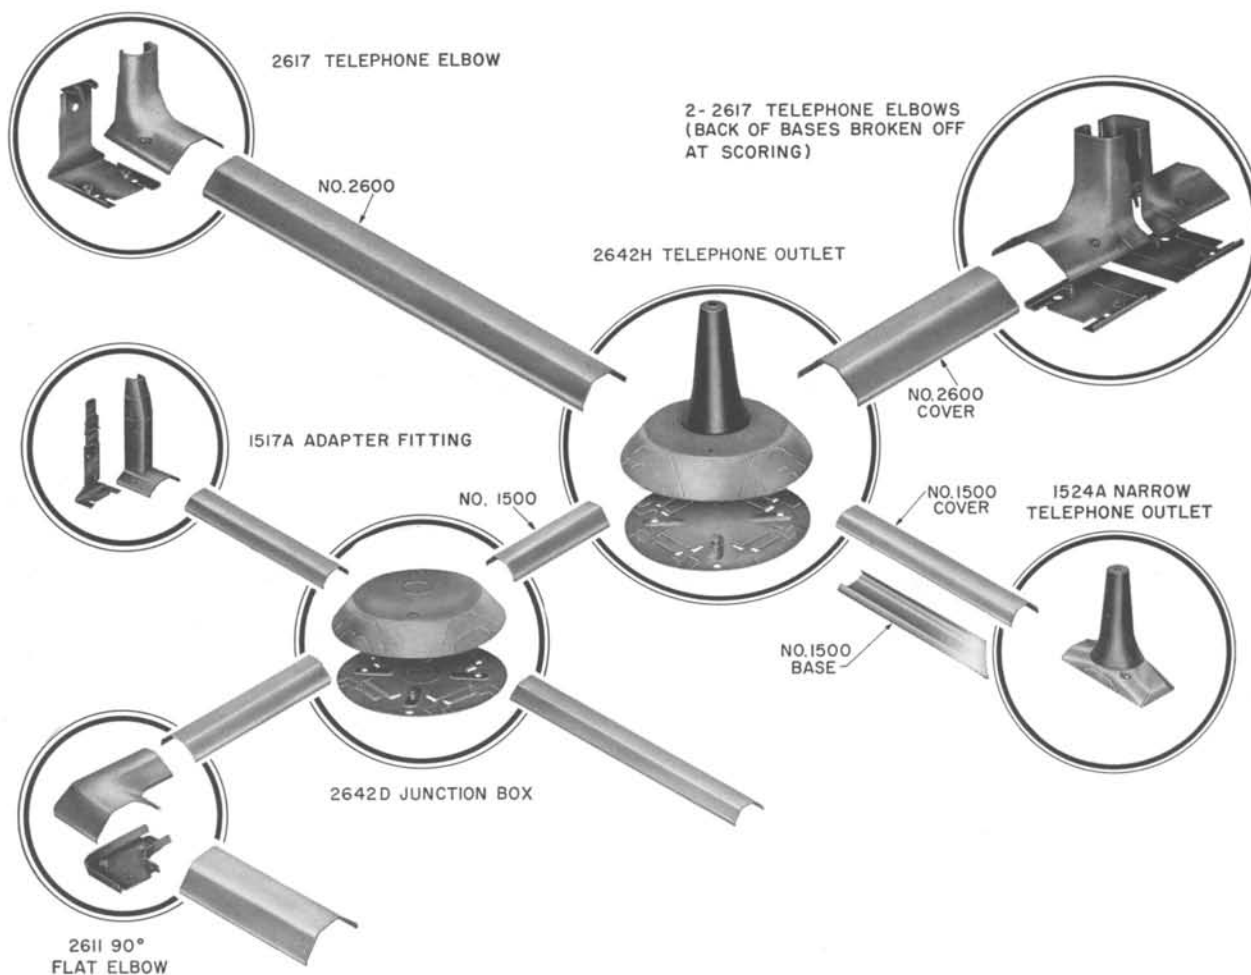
TYPICAL METAL OVERFLOOR DUCT LAYOUT
